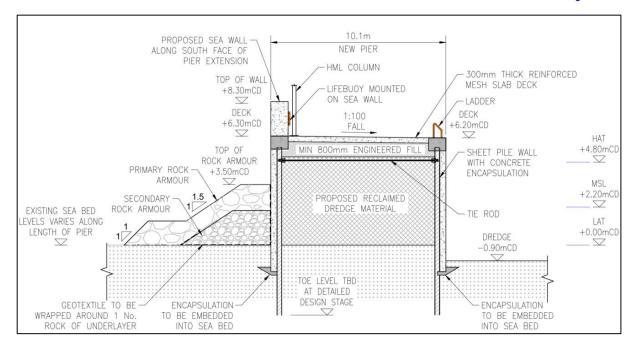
Proposed Section of the Pier Extension (Refer to Appendix D)
